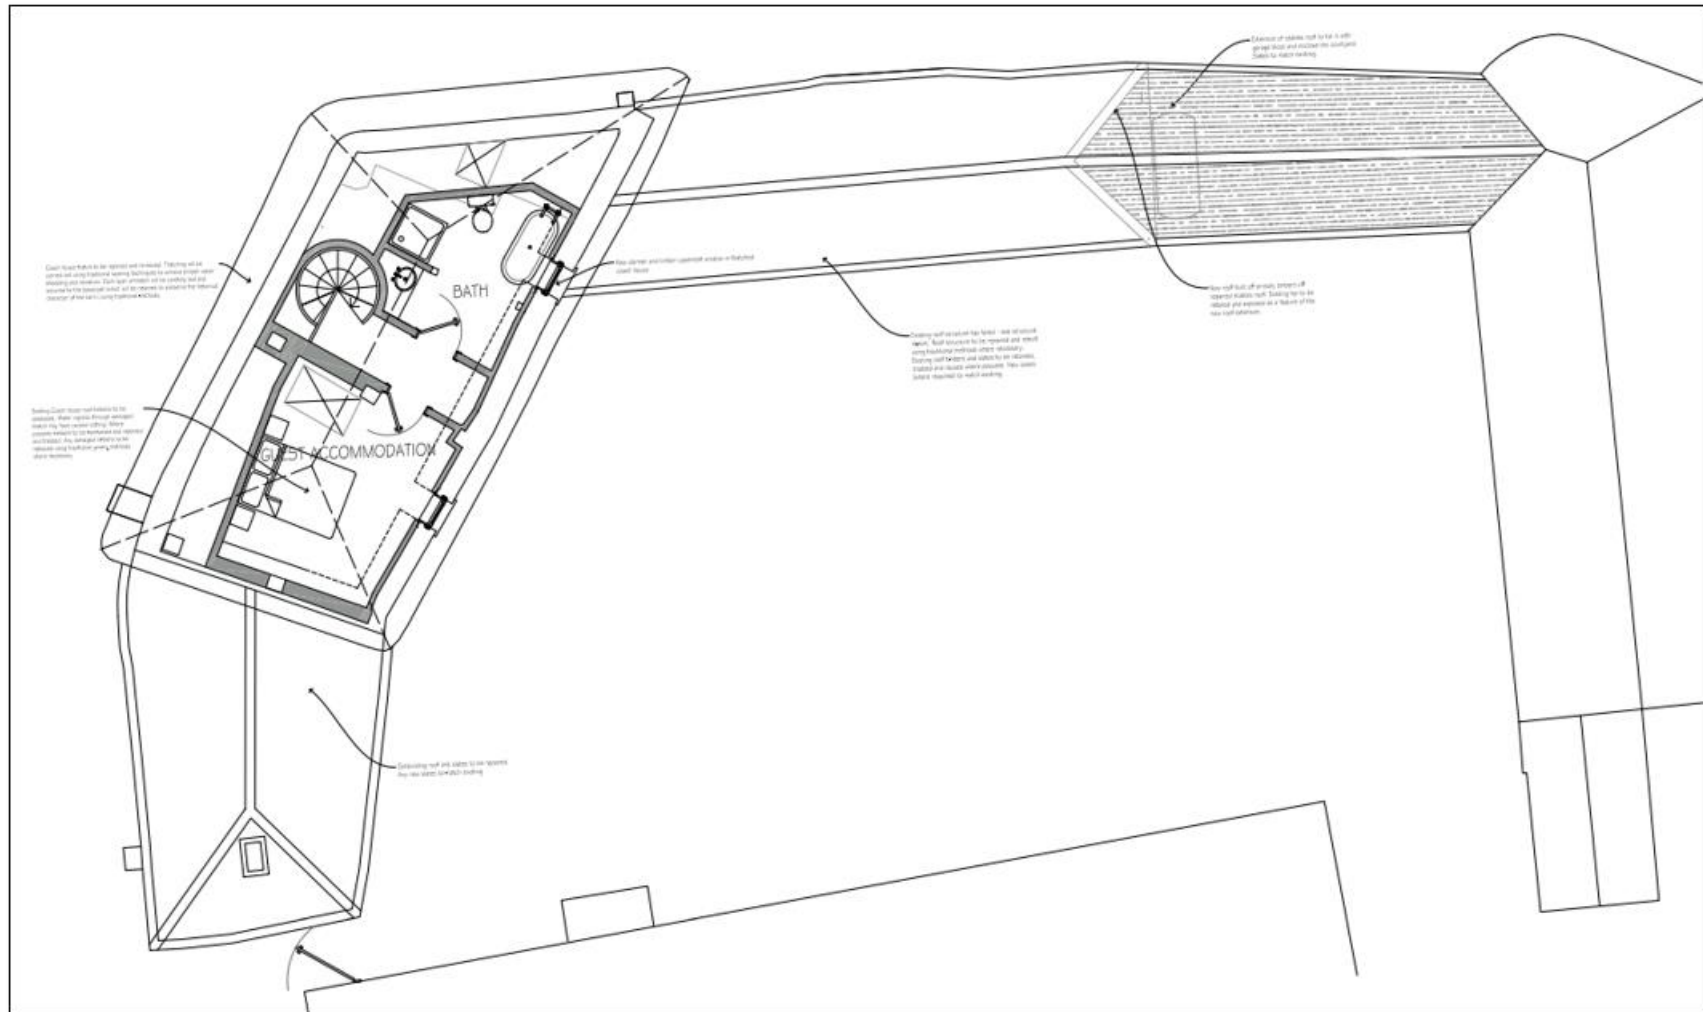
Proposed first-floor plan of the outbuildings at Bec House (Fowler Architecture and Planning).
